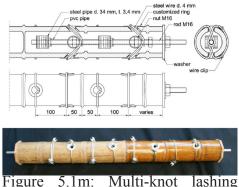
Multi-knot lashing joint, Windyowijatnoko
